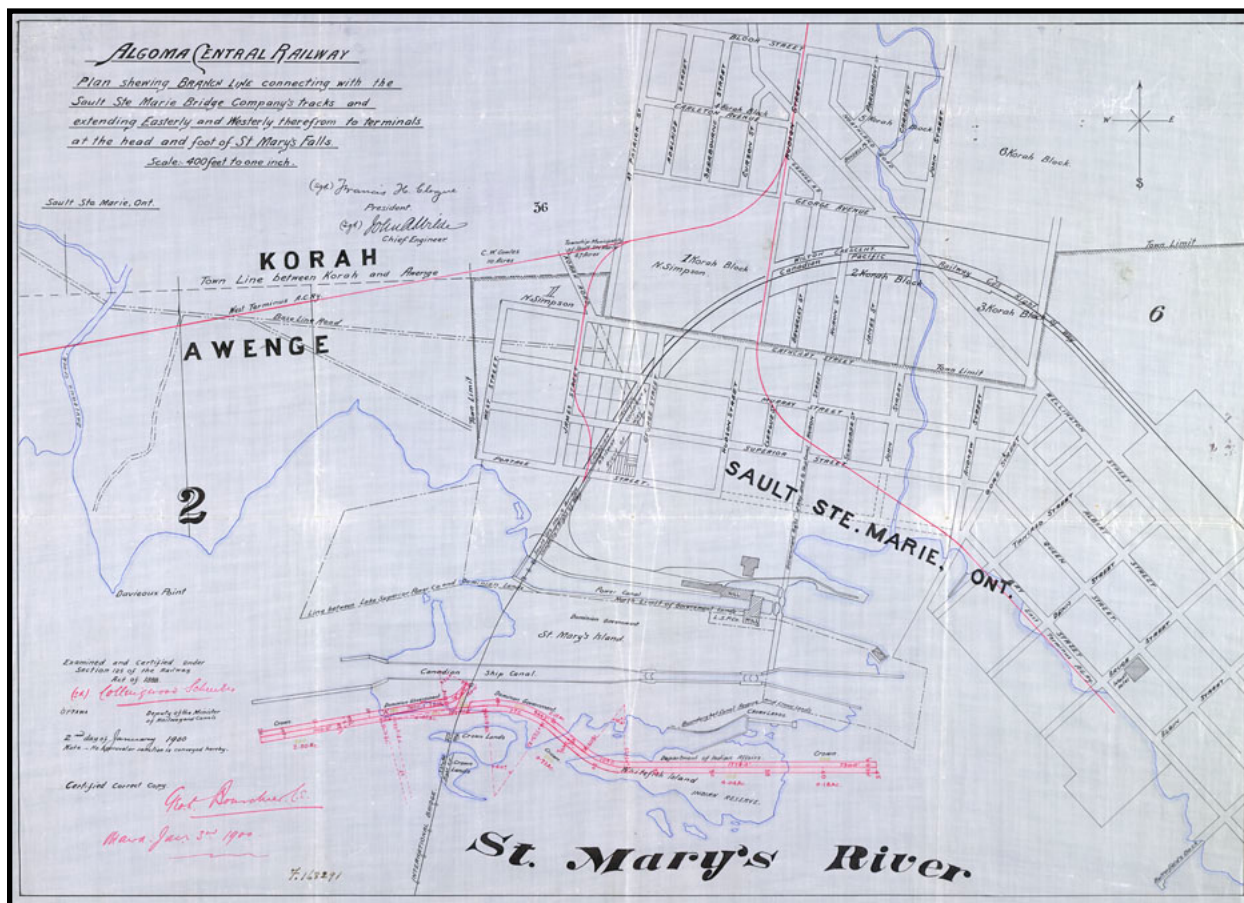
Plan for the juncture of the Algoma Central Railway with the Canadian Pacific Railroad at Sault Ste. Marie (Algoma Central Railway, 1900)
